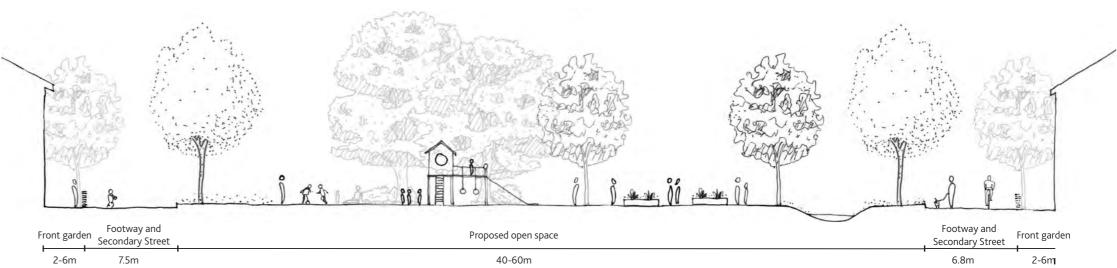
Typical street section 9 - Active Travel Route linking proposed open space
